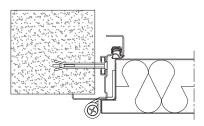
Installation of an opening frame with a thermal break using anchors directly through the opening frame
